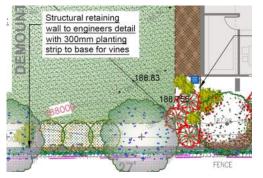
Extract of landscape plan (Source: Conzept Landscape Architects)
